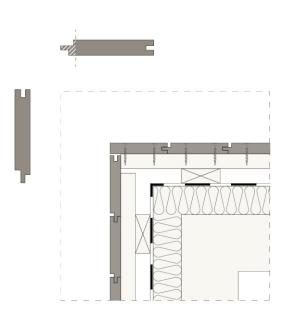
External corner finishing by cutting off the groove edge of one of the boards
